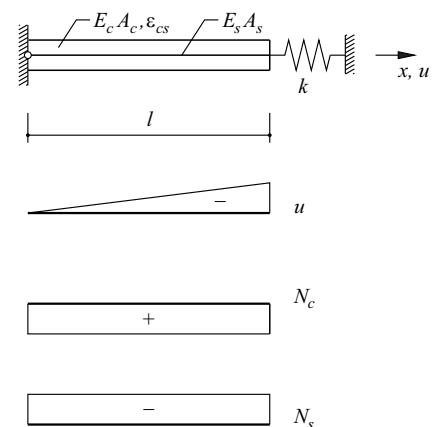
Inhibited shrinkage of a reinforced concrete member
